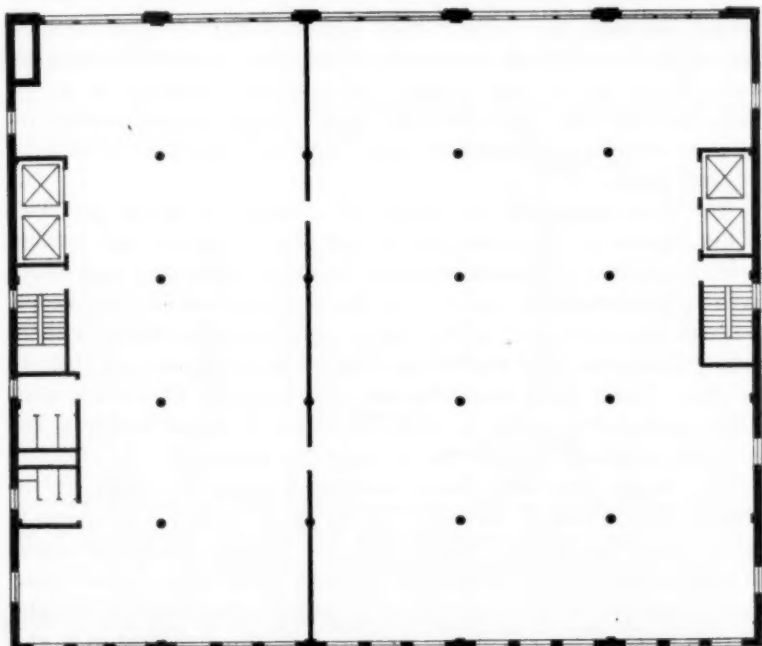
FLOOR PLAN OF TYPICAL LOFT BUILDING SHOWING FIRE WALL WITH DOORWAYS
